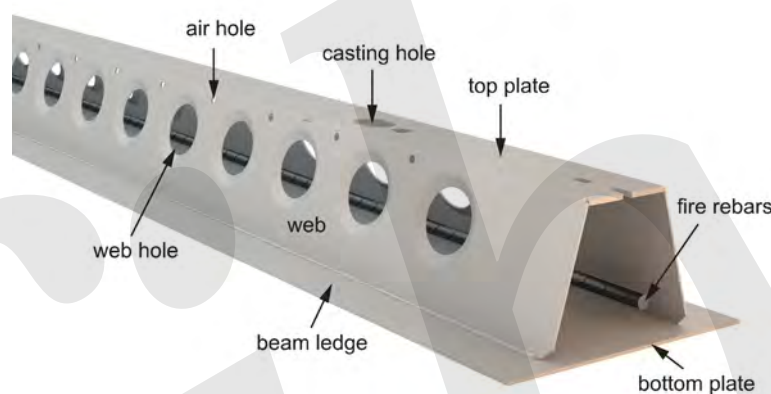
Example of Slim Floor beam, DELTABEAM®, courtesy of ©Peikko Group Corporation.
